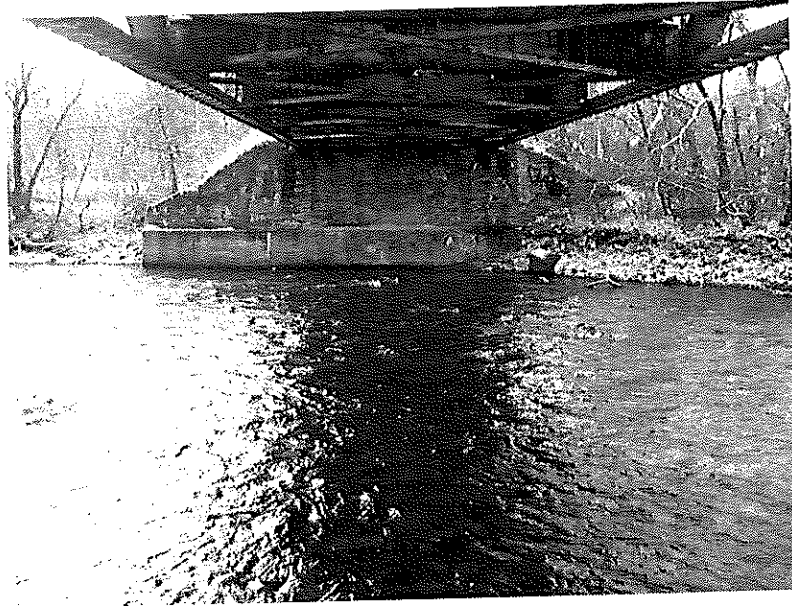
View to the North from the South Bank showing Corrosion of Supporting Members below the Deck and Condition of the North Bank Abutment
